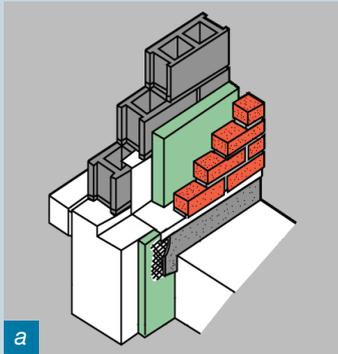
ccSPF applied to a concrete block wall with a brick veneer cladding (photos courtesy of Huntsman Polyurethanes).
